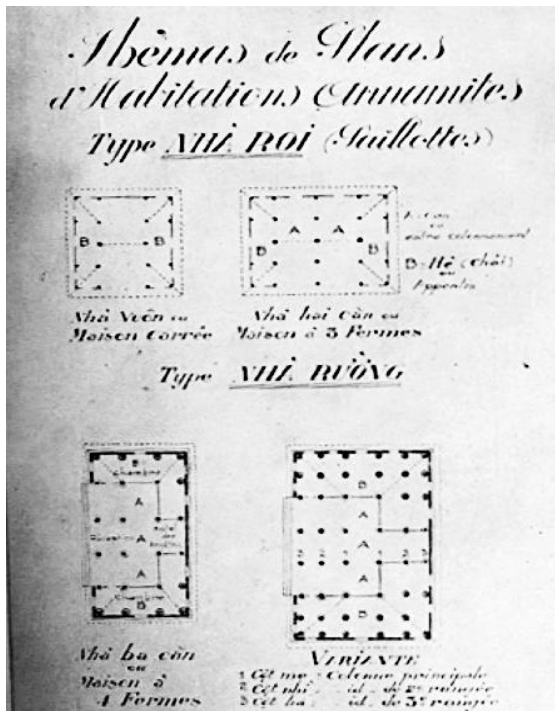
Floor plan of the “Nha Roi” and the “Nha Ruong”.
